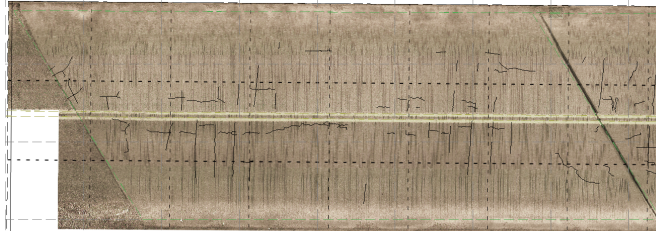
Existing Cracks of Bridge Deck No. 22383-Span 1
